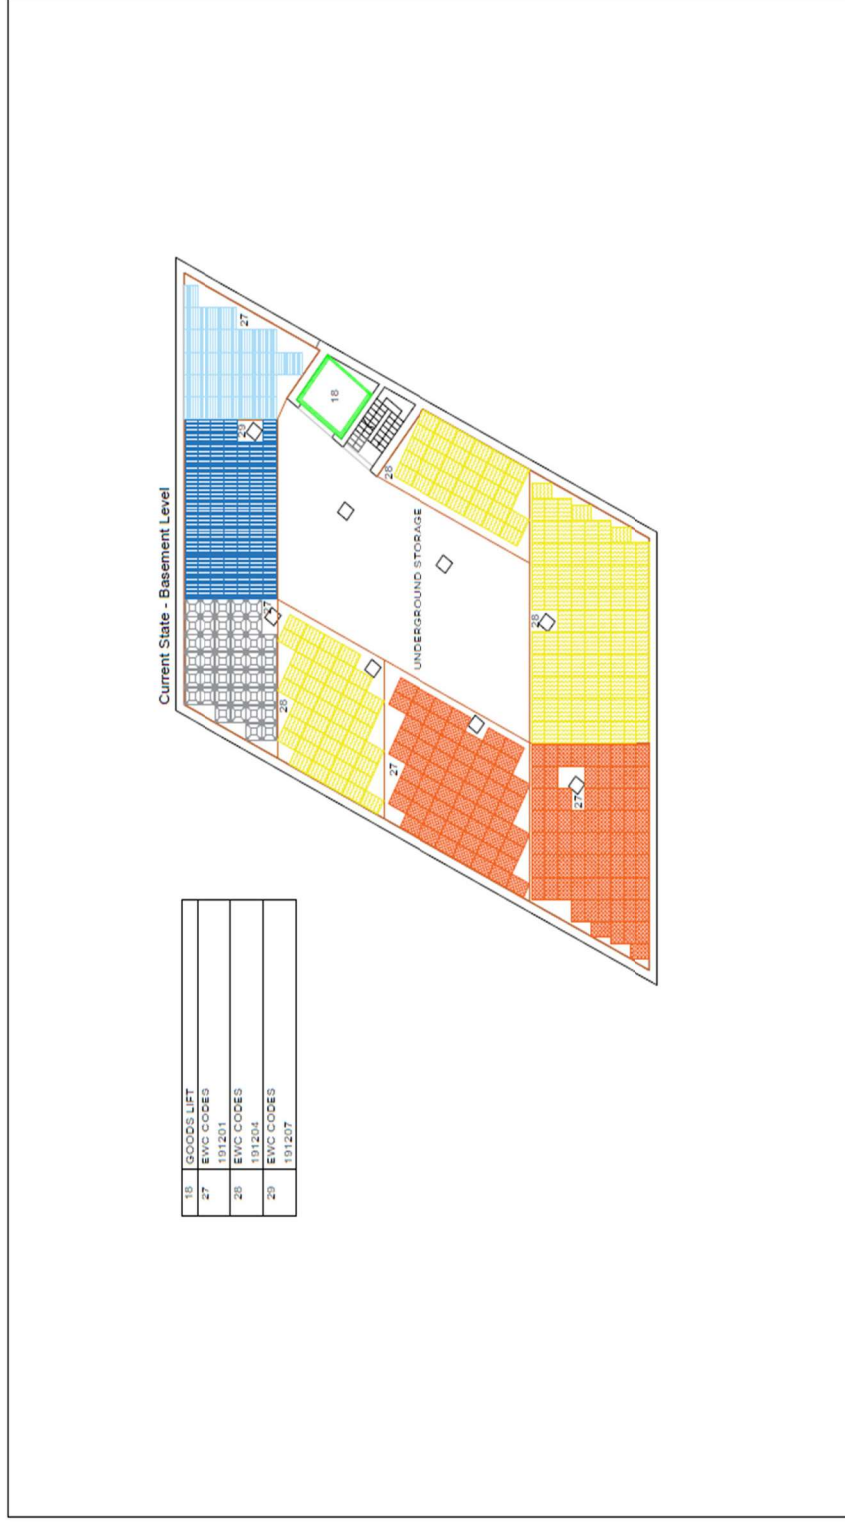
Site layout of the permitted installation to undertake the specified operations. The extent of the site is indicative and shall not be used for interpretation purposes
